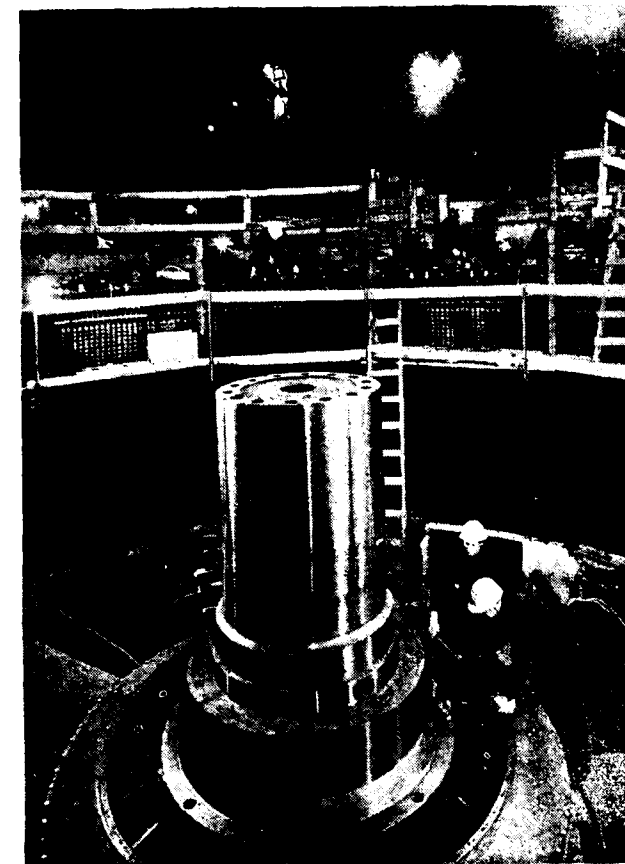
The lower guide bearing of the generator during the final stages of erection. In the background, the stator winding is being connected at one of the six joints of the stator. (52182. Photographed by Ekholtz)
